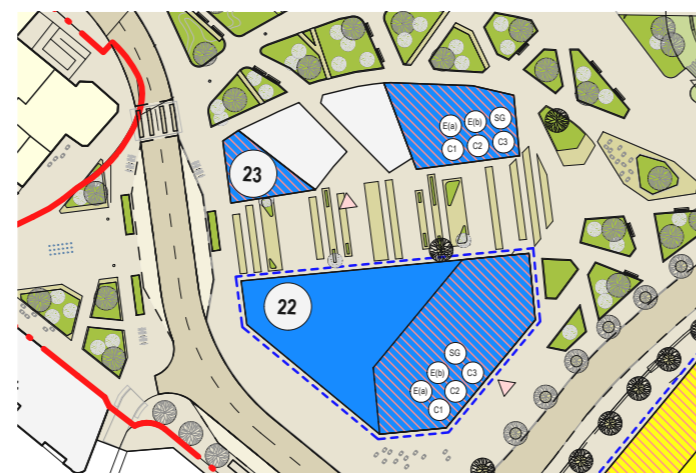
Illustrative Masterplan alternate partial retention Parameter Land use Plan
